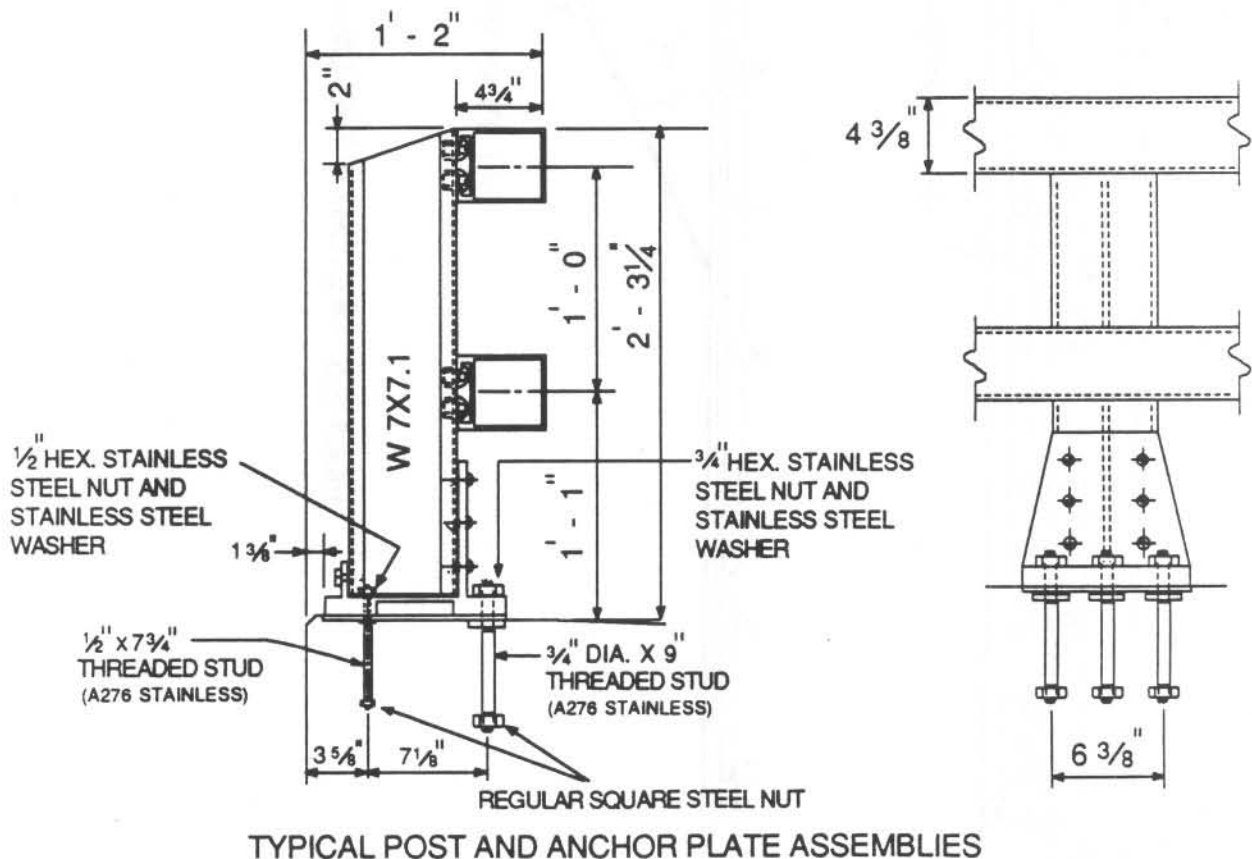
TYPICAL SECTIONS OF BRIDGE RAIL
